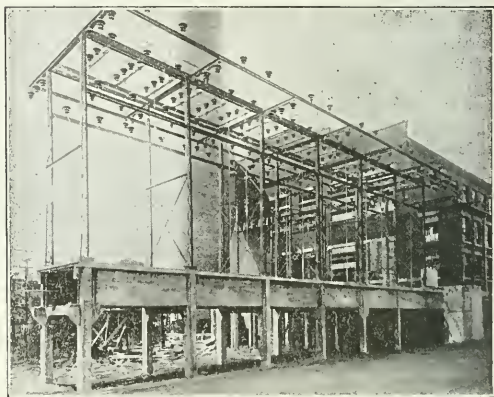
SUBSTATION INSTALLATION OUTSIDE A POWER HOUSE
